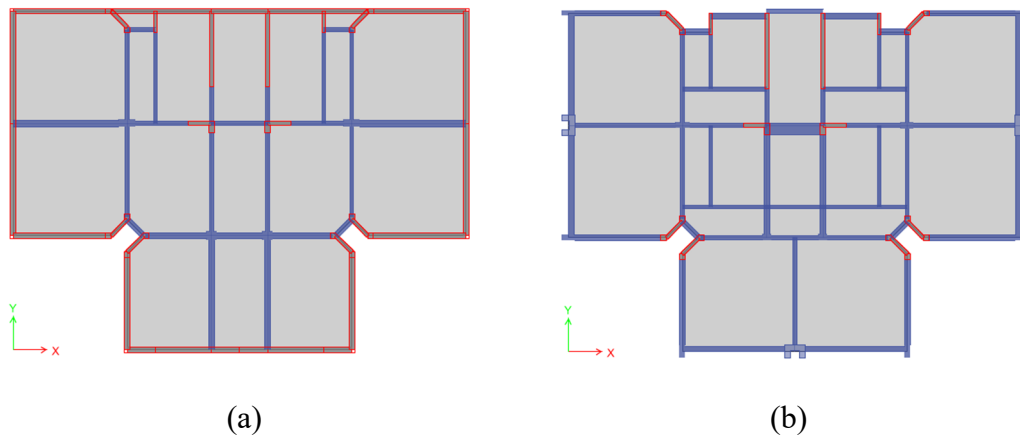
Floor plan views of the (a) first basement and (b) typical (fourth floor) floors for the as-built model.
